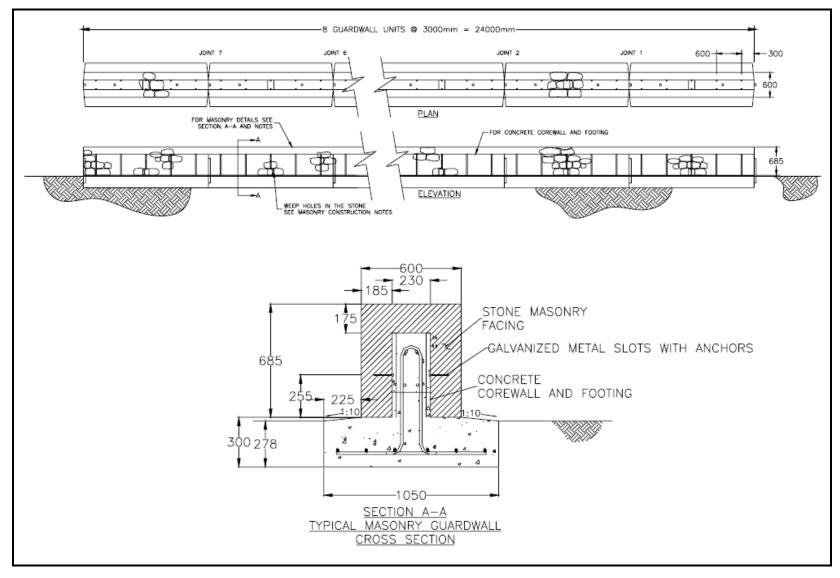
Layout and Cross Section of Rough Stone Masonry Guardwall
